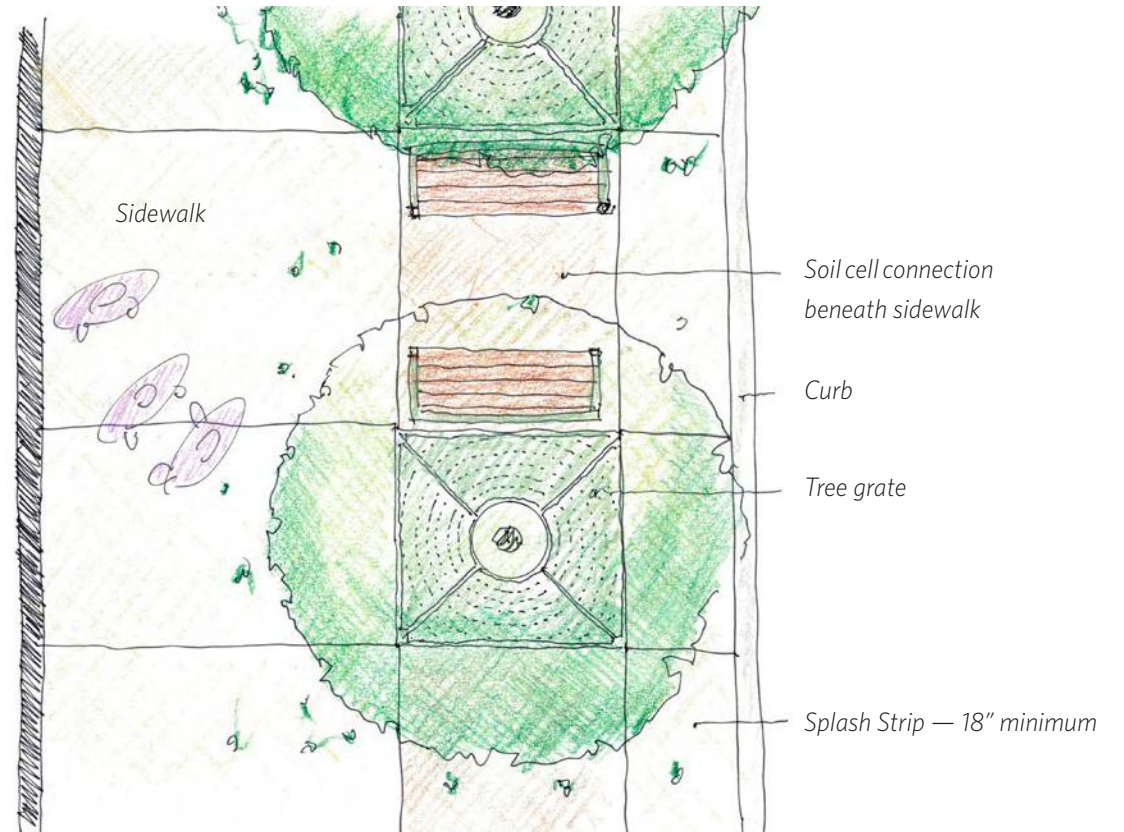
Street Tree Planting Details with Soil Cells & Bump-Outs — Plan
